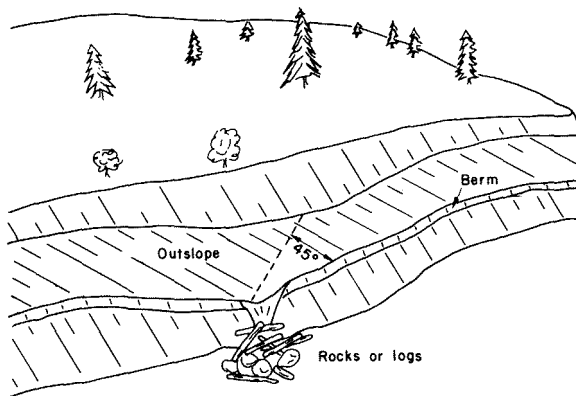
Rolled grade and cross drain (after Haussman 1960).
